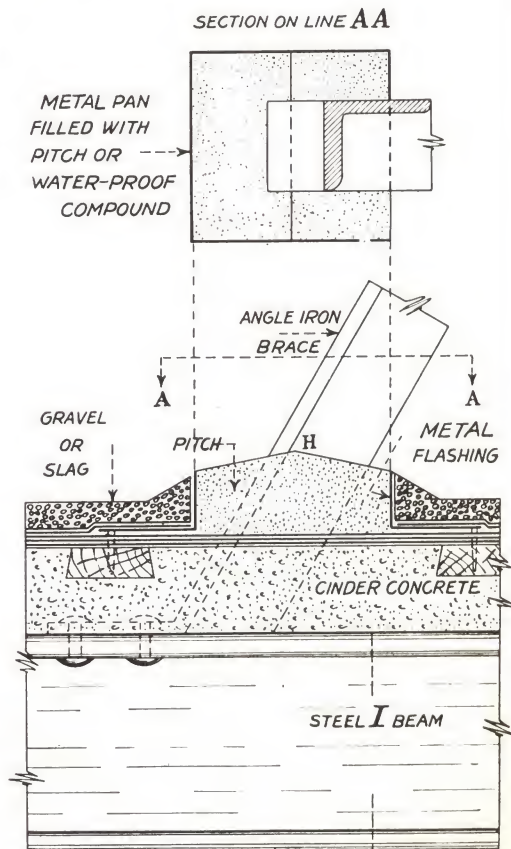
OBTAINING WATER-TIGHT JOINT AROUND
